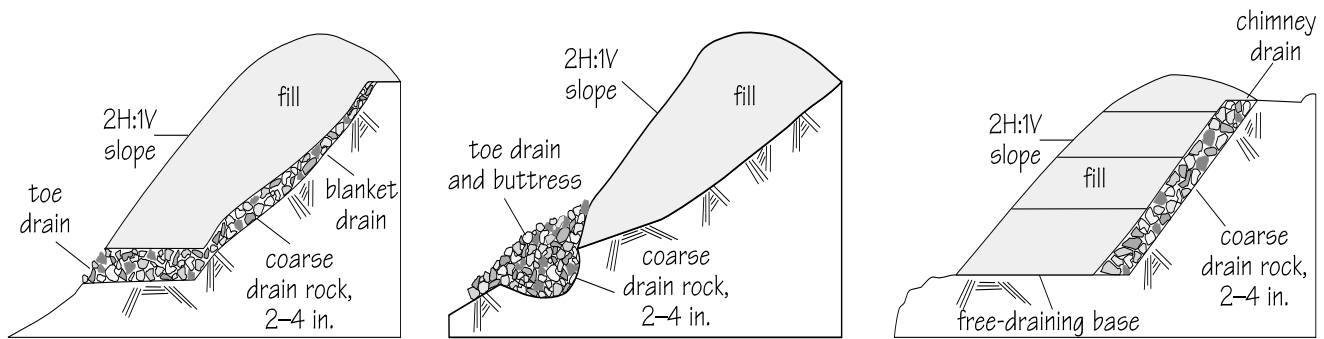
Details of toe, blanket, and chimney drain construction shown in cross section. (See also p. 2..)
